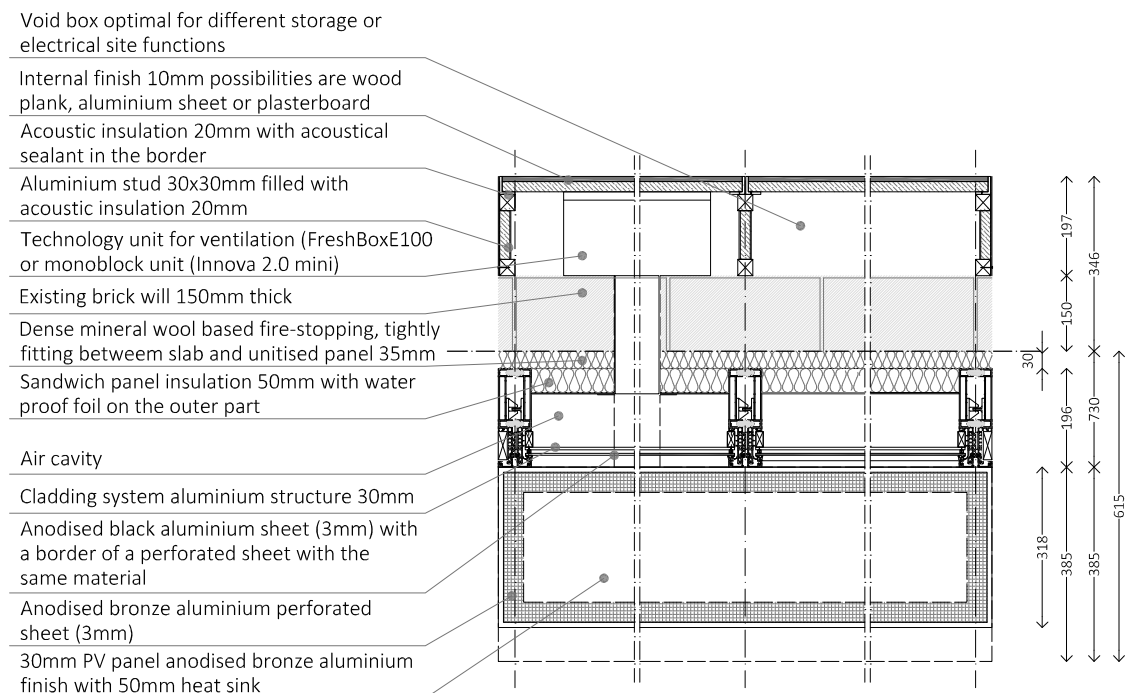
Panel B horizontal detail with a brick wall in between showing two technical units on each panel side (SCALE 1:15)
